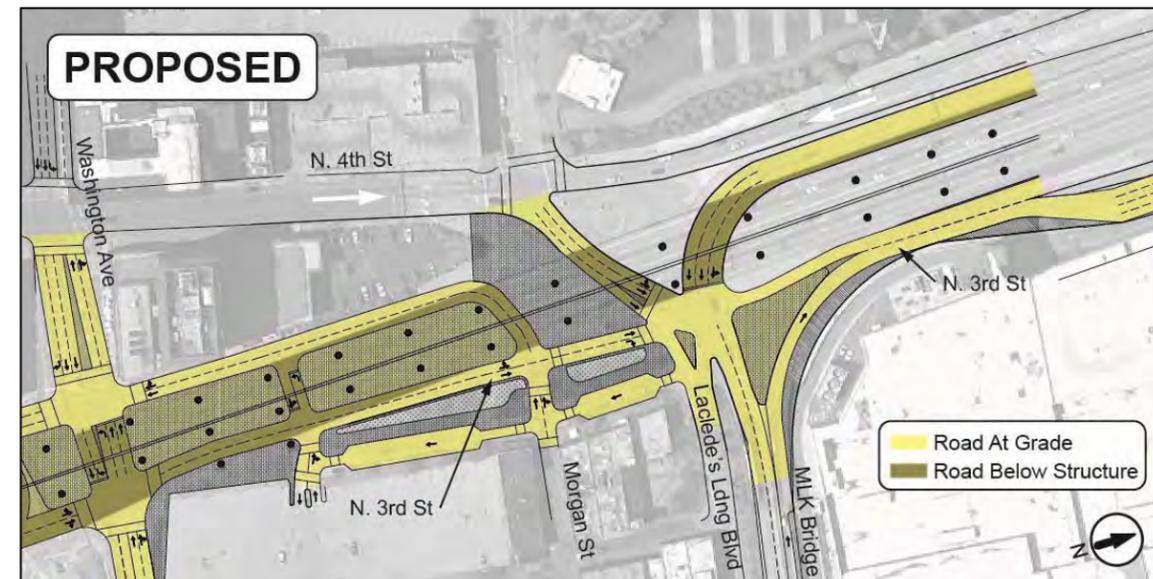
Proposed Layout of North 3<sup>rd</sup> Street and Extension to I-70 On-ramp
